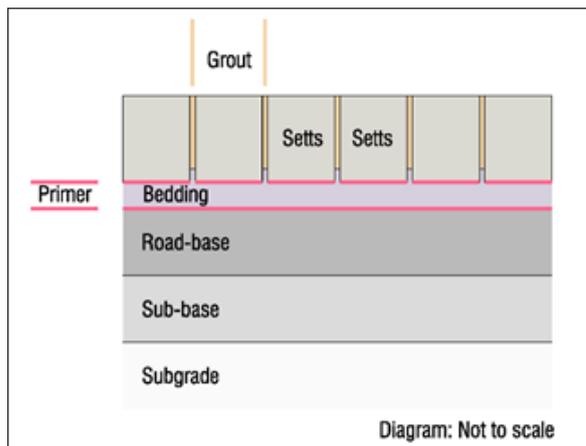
A diagram showing the typical build-up of a BS 7533 compliant pavement construction. This diagram refers to the Moist Bed with Full Depth Slurry method.
